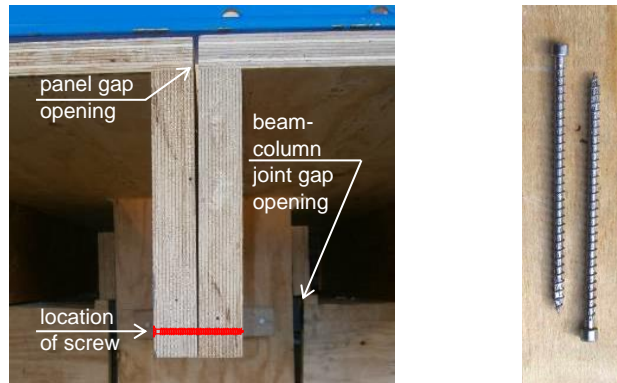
Beam-column joint and floor gap opening with undamaged fasteners of the two-bay frame system (Test setup 3 - concentrated gap solution)
